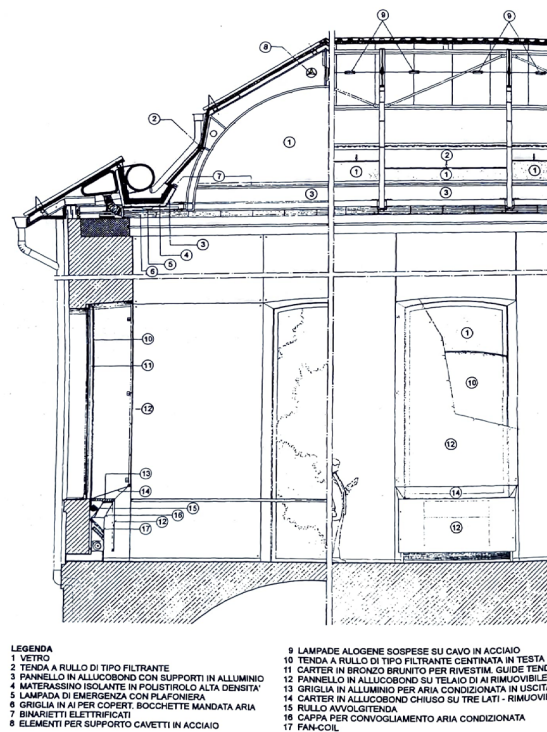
Technical details and plant lighting and air conditioning of the new roof structure of the long wing.
